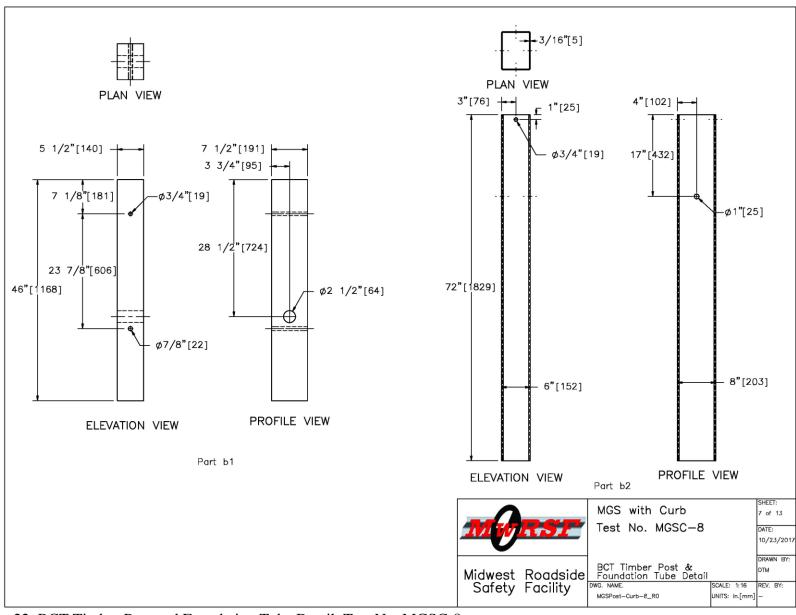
BCT Timber Post and Foundation Tube Detail, Test No. MGSC-8
